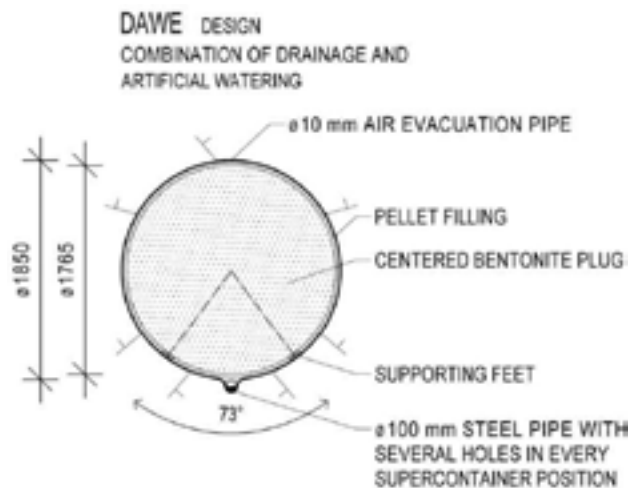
Artificial watering and drainage alternative, a pipe installed in a groove on the bottom of the drift.
